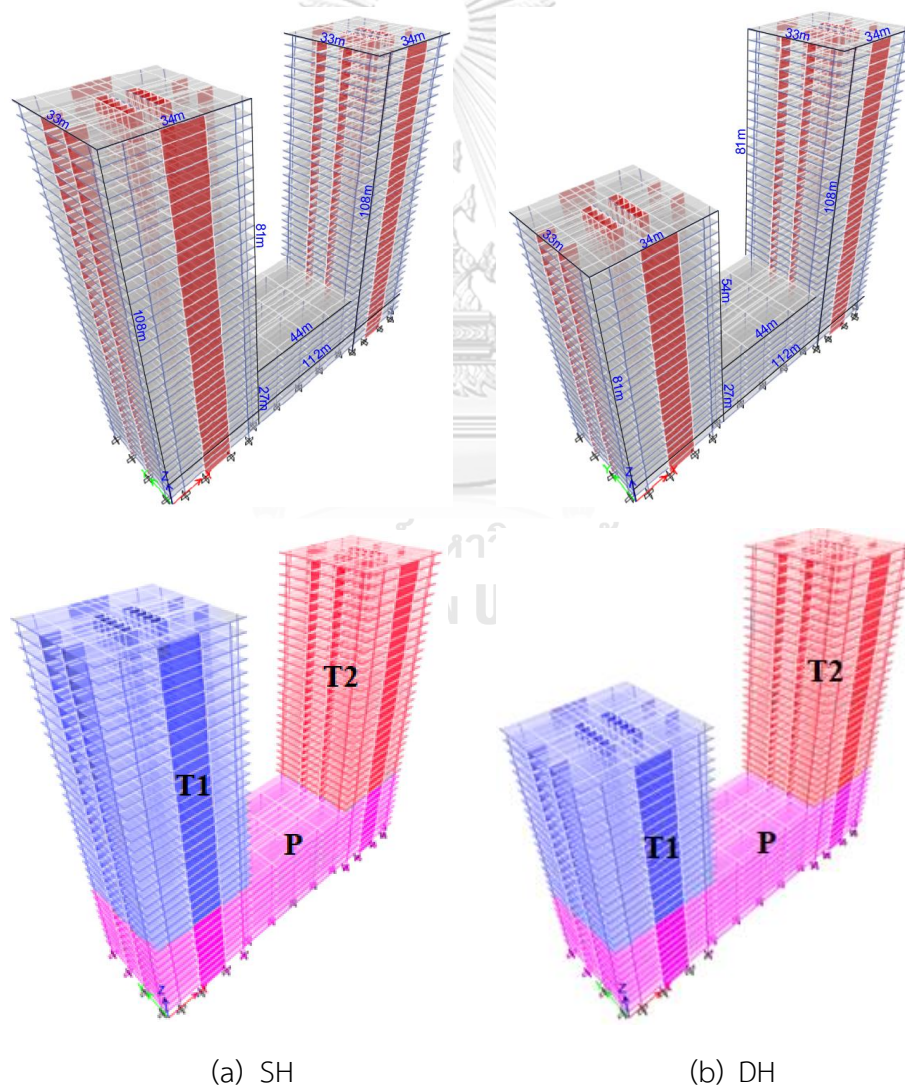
Towers denotation for building; (a) SH and (b) DH.
